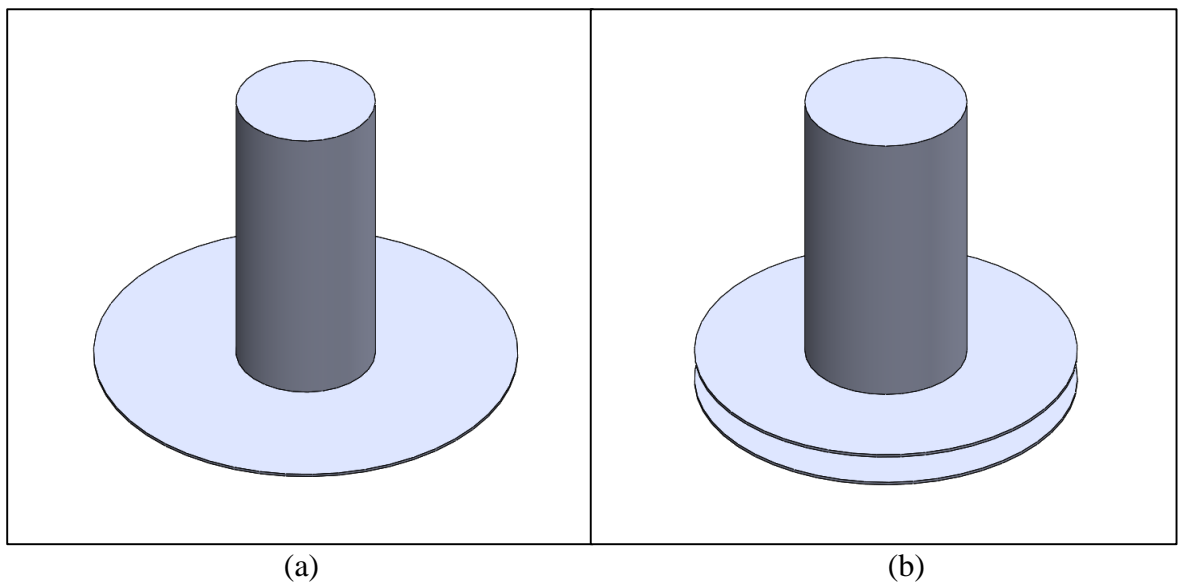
(a)circular shaped bridge piers with one collar around pier and (b)circular shaped bridge piers with two collars around pier.
